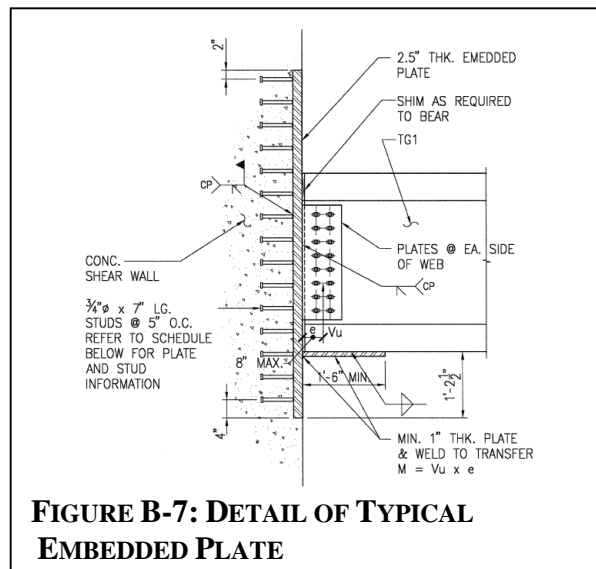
DETAIL OF TYPICAL EMBEDDED PLATE
